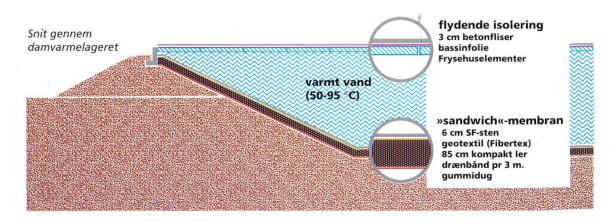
Cross section through the pit heat storage, Ottrupgård (brochure).
